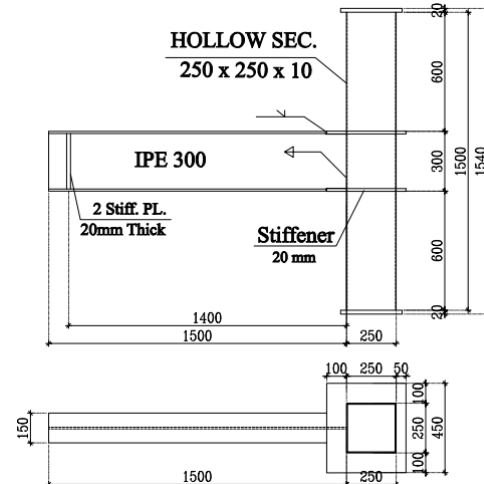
B.C. Stiffened Plate around the column (S-6)
